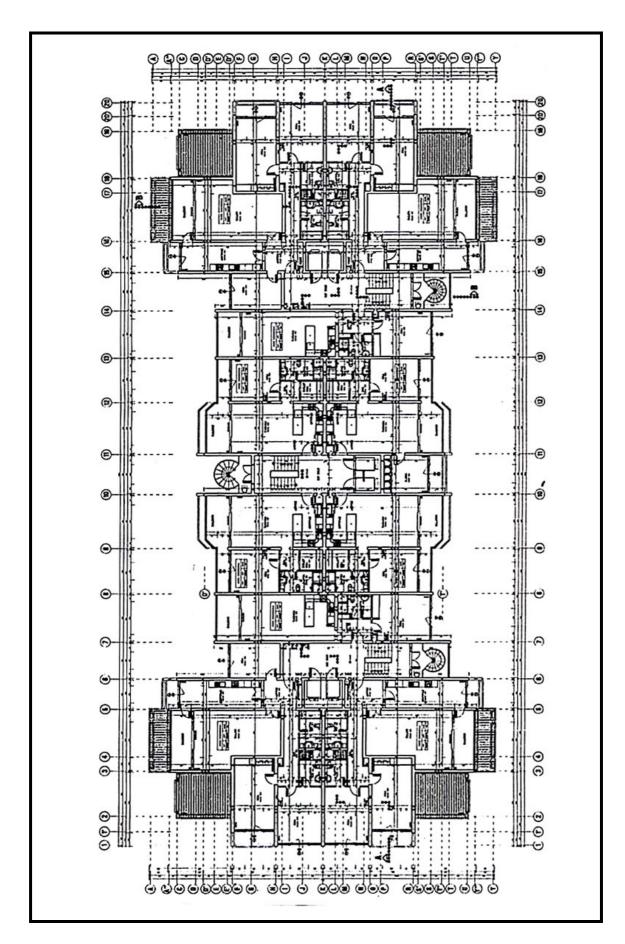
Mavişehir II; Kuğu 15th-Floor Plan
